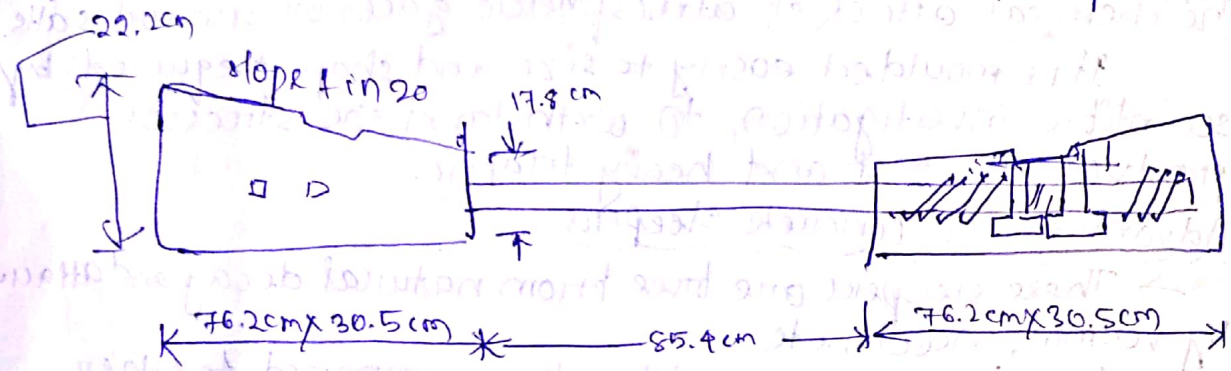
Reinforced Concrete sleeper (Composite Type)
